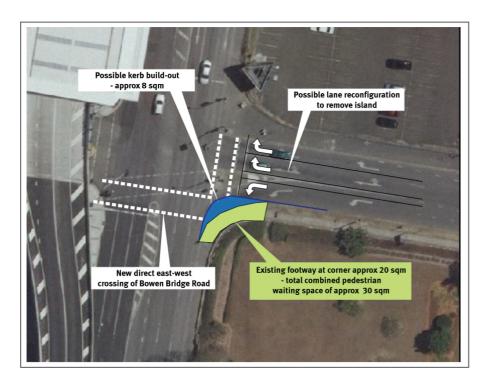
Possible enhancement to pedestrian waiting zone at corner of O'Connell Terrace and Bowen Bridge Road
